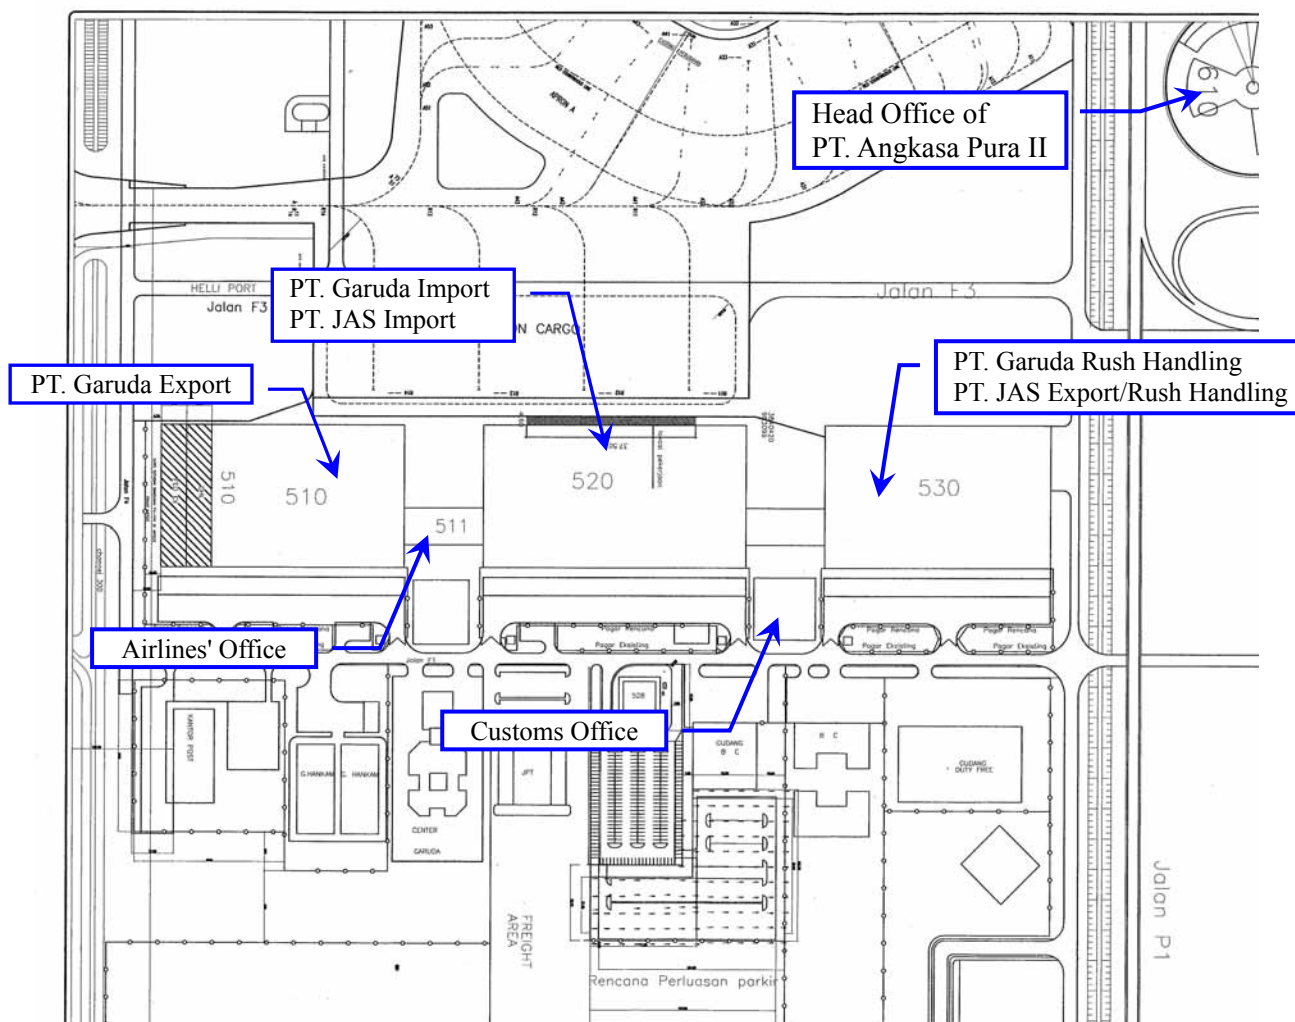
General Layout Plan of Cargo Terminal
